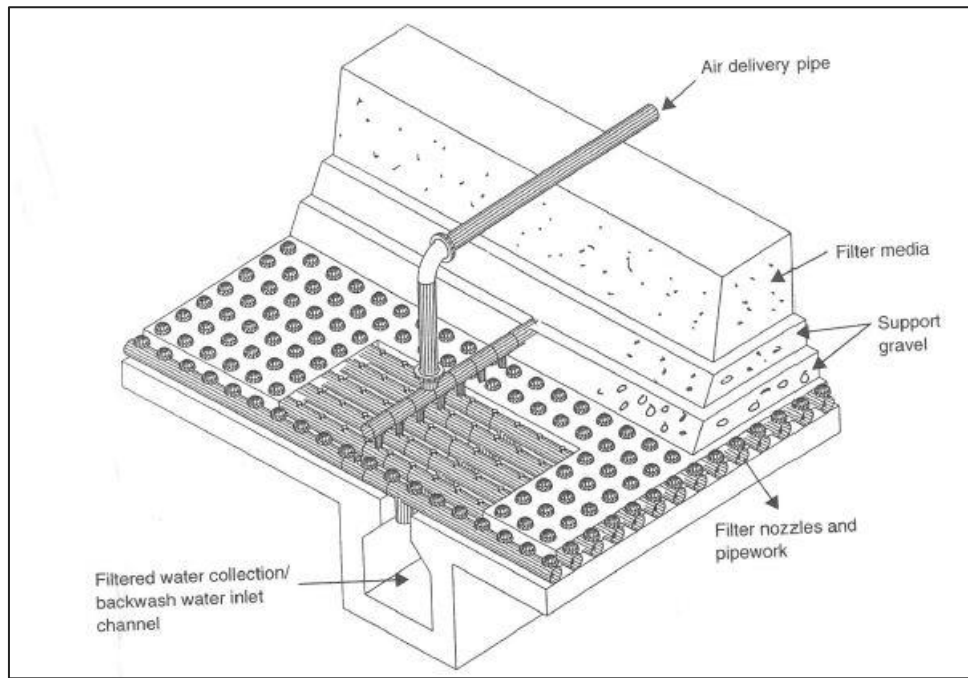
Example Detail of Gravity Media Filtration with Pipe Lateral Underdrain System (Binnie, Kimber and Smethurst, 2002)
